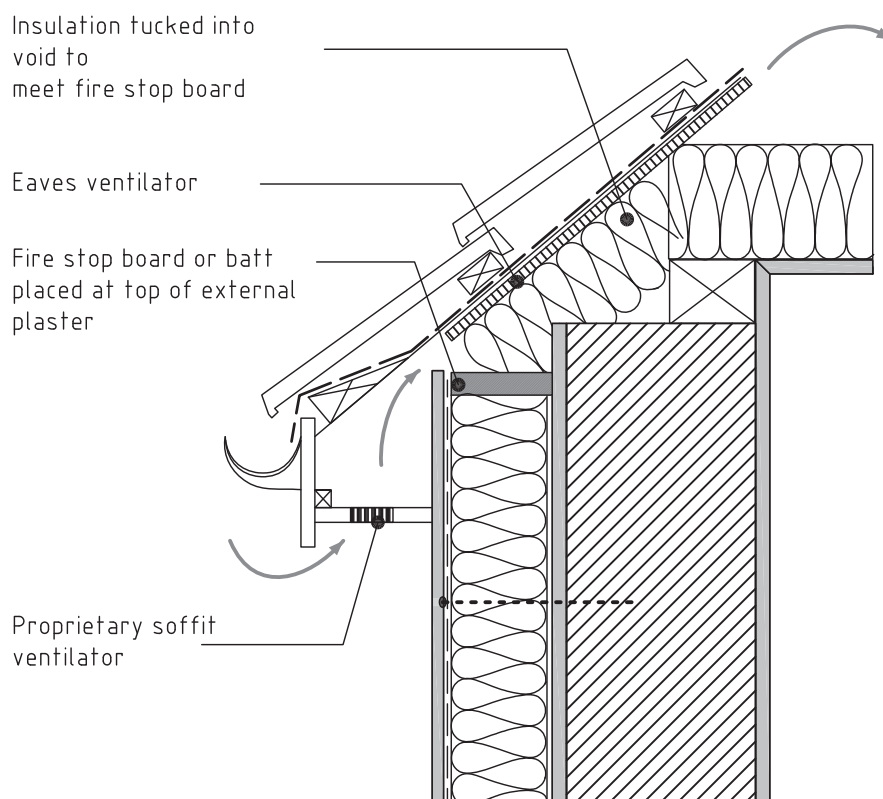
Junction of external insulation and roof insulation at ceiling level
